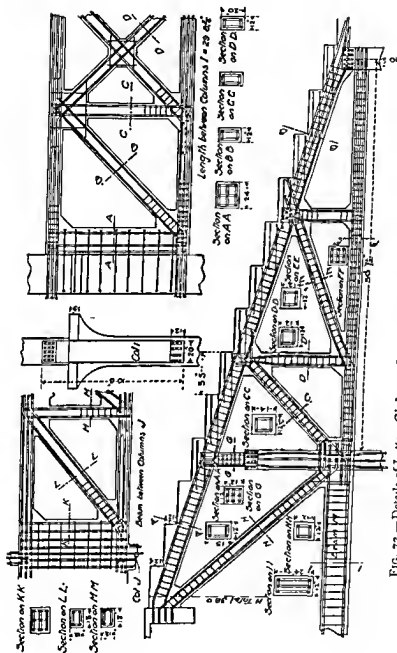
Details of Lattice Girders and Framework supporting Automatic Flour Store.
